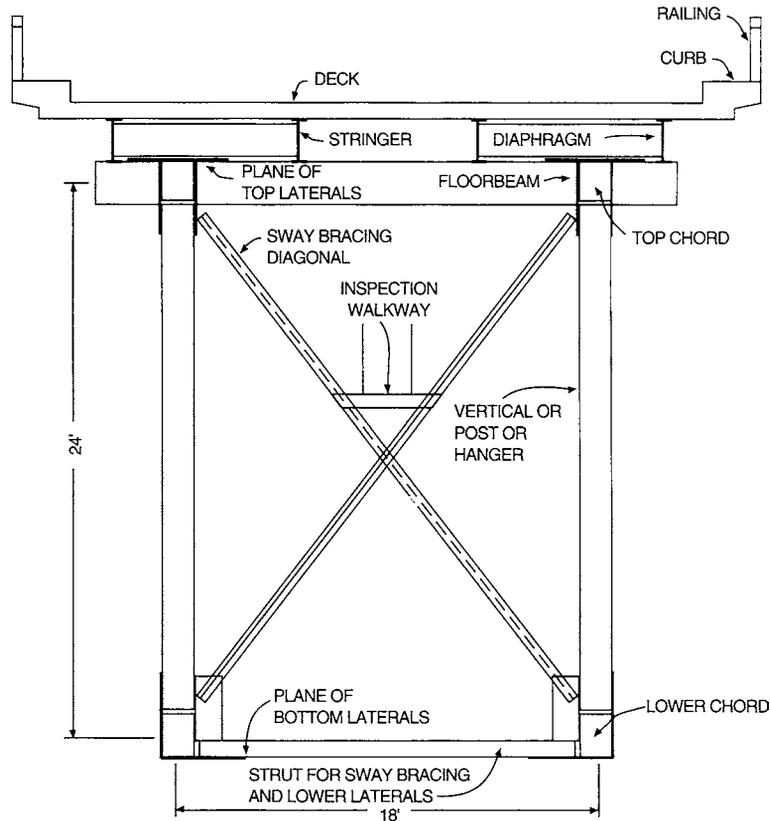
Cross section shows principal parts of a deck-truss highway bridge.
